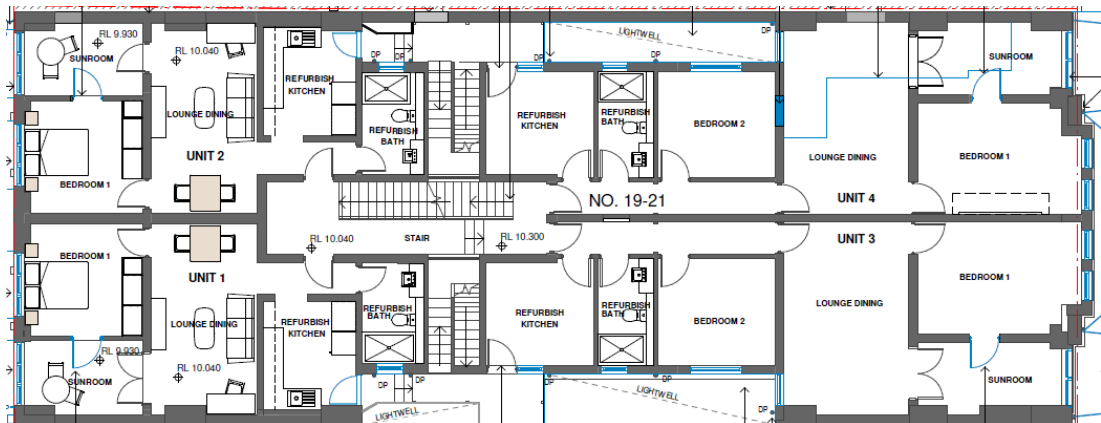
Proposed first floor plan. (Source: NBRSArchitecture)
